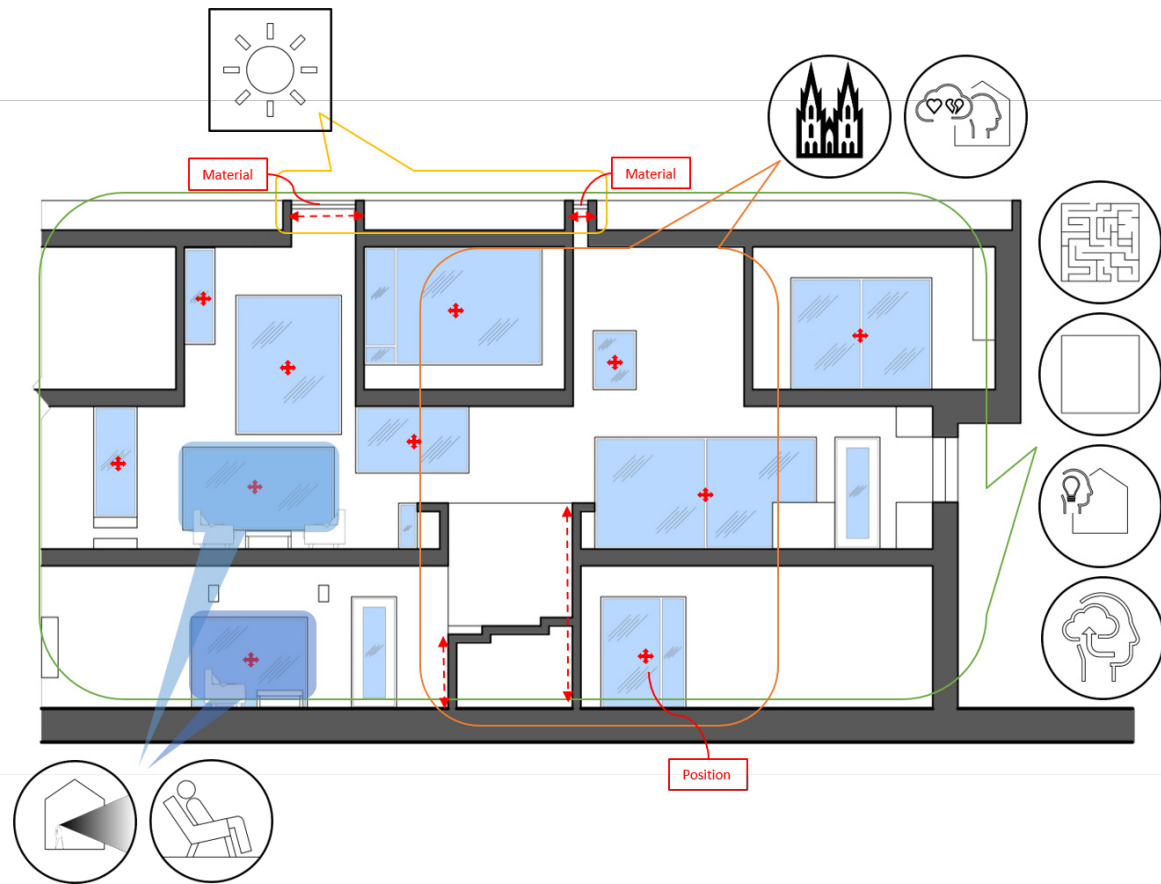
Use case no. 2 - recreated based on the facade section of the Concrete House by Carl-Viggo Hølmebakk (Concrete House - Carl-Viggo HAS, Stange, Norway, completion in 2015) illustrating the explanation tags (ET) for Daylight (solar gain) on the top two ceiling windows, the ETs of Immensity and Expression for the blended spaces, and high down-drops in the middle, the ETs of Complexity vs Simplicity, Concept, Experience, Comfort and View for the layout and organization of spaces and openings, together with the constraints for material and position of the windows
